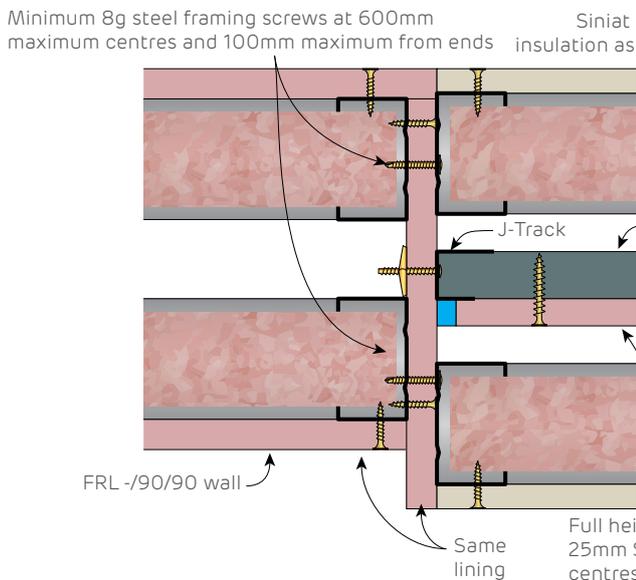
Interhome Highrise Wall Transition to Double Stud Fire Rated Plasterboard Wall Plan
